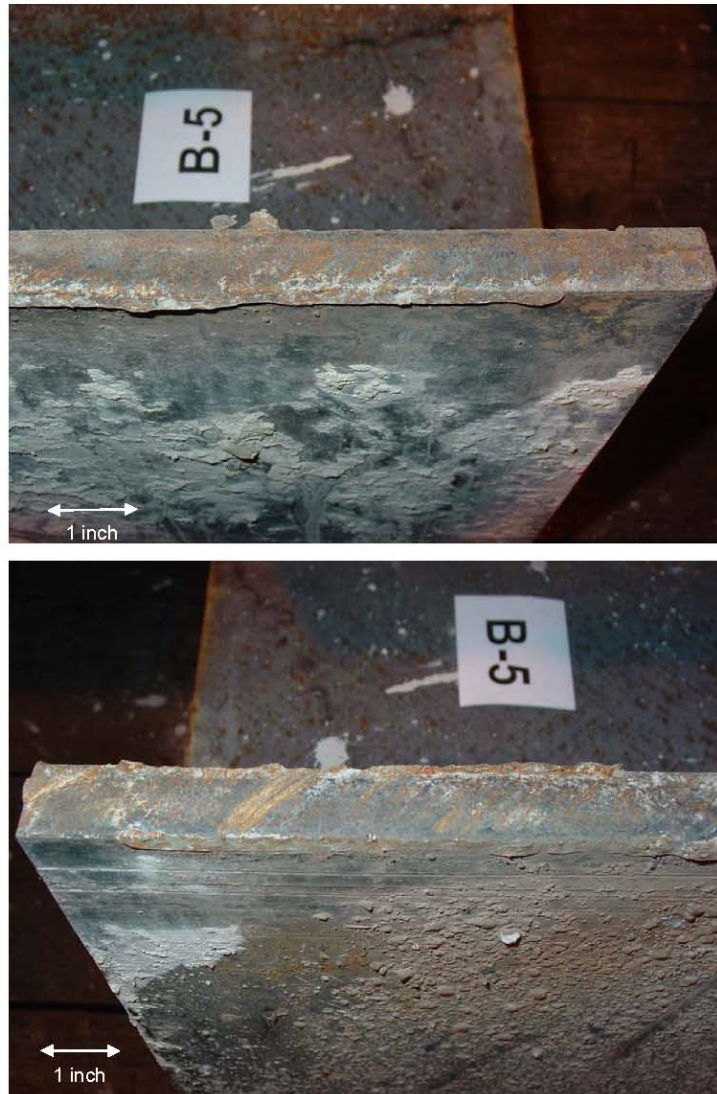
Enlarged Views of Ductile Weld Fracture on Tie Beam B5. Note Small Size of Deposited Weld.
